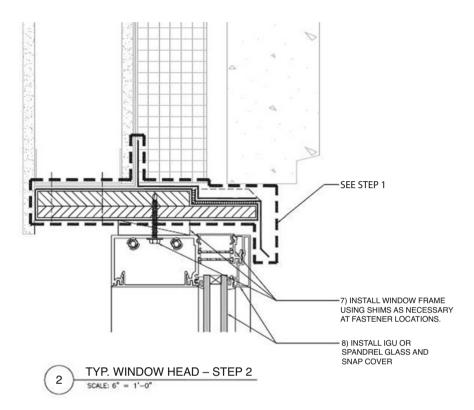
Step-by-step illustration of window head installation (Step 2)
